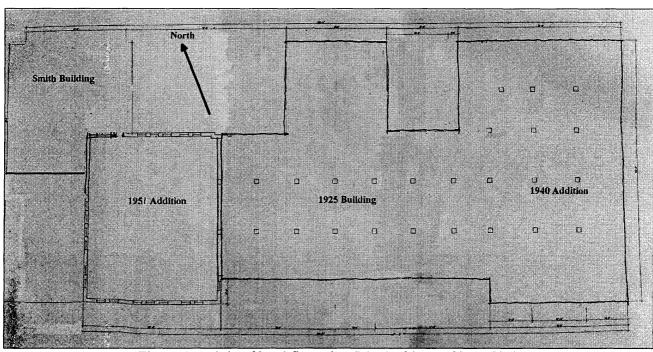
Attic/roof level floor plan (M+ Architects, Sioux City)
